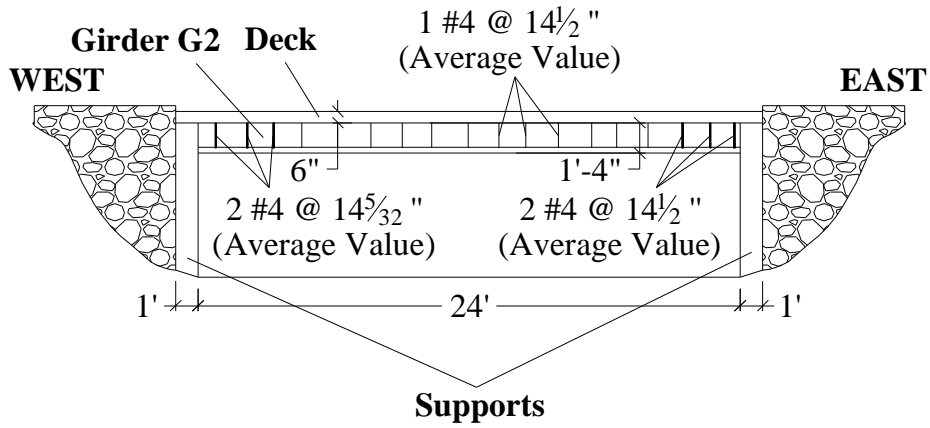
Shear Reinforcement in the Inner Girders (G2 and G3)
